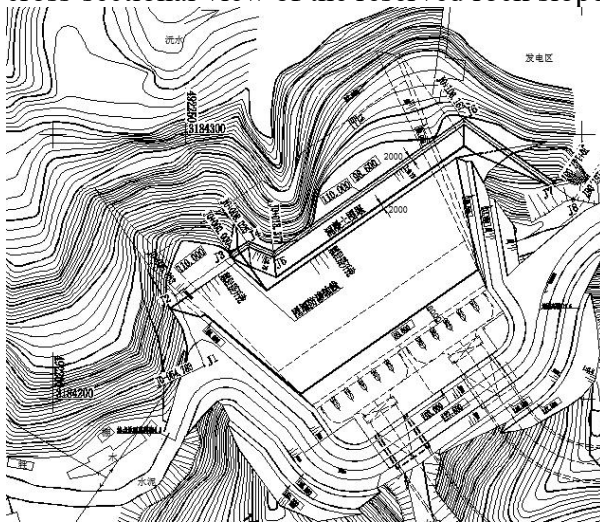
Layout plan of reserved rock ridges and concrete cofferdams at the water inlet
